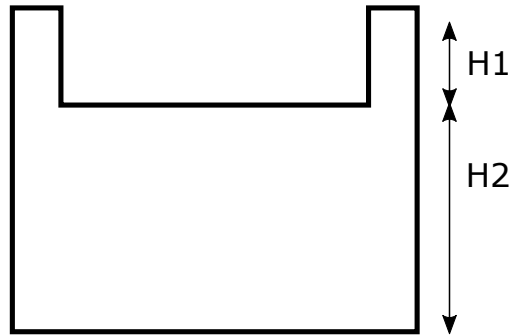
Typical geometry of the sheet pile wall used in centrifuge experiment.
